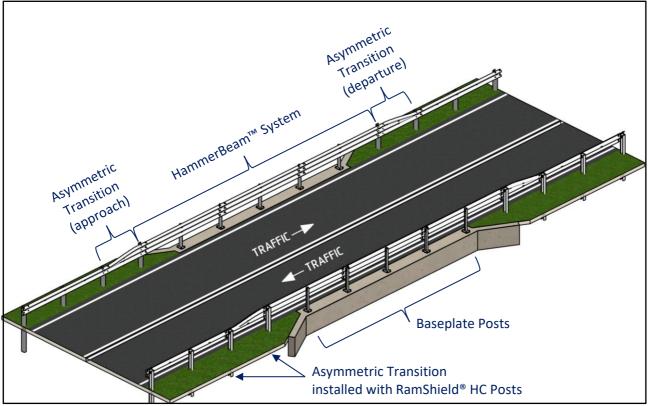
HammerBeam™ Baseplate Posts Assembly.
